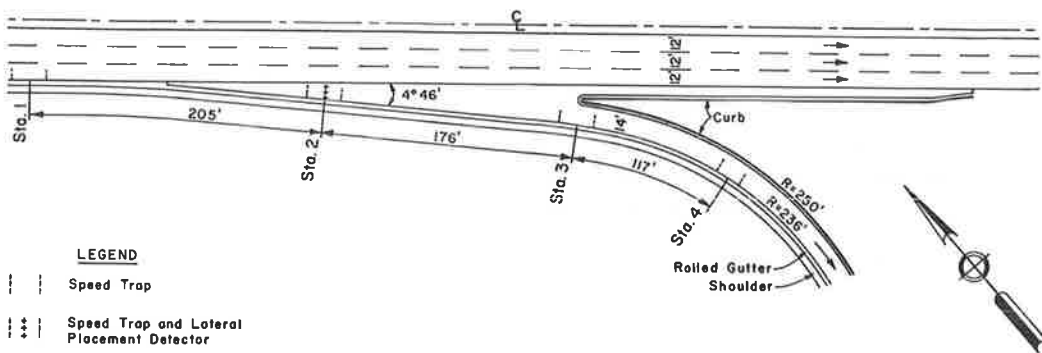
Study site 41, eastbound exit ramp to Lakewood Blvd., Santa Ana Freeway.
